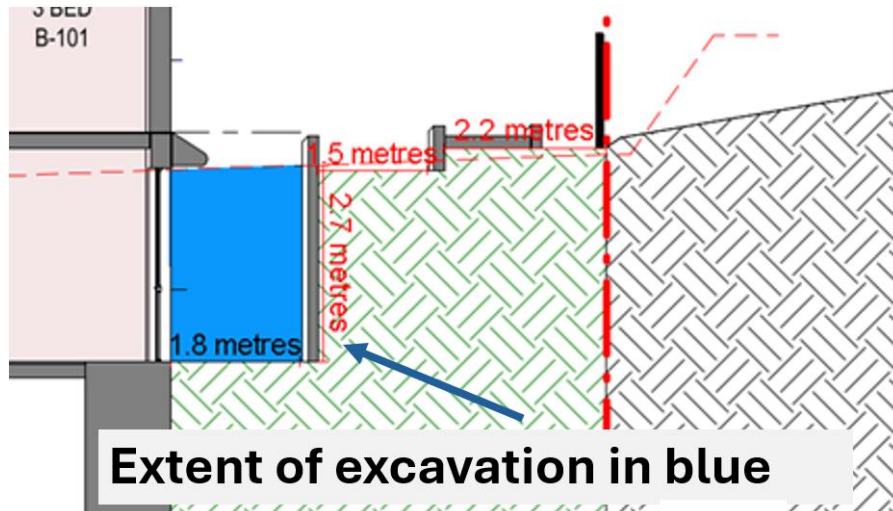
Building B - Northern Setback - +2.7m excavation, min 2 retaining walls + footings (Source: Council's Landscape Officer)
